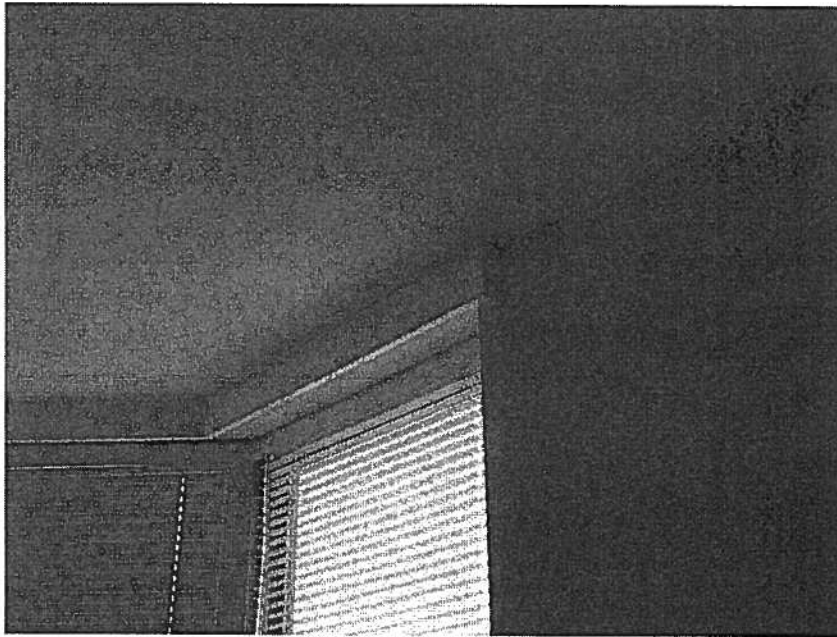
Ceiling water staining at Suite 2305. There is an open joint in the exterior of the window wall above this location allowing water ingress.
